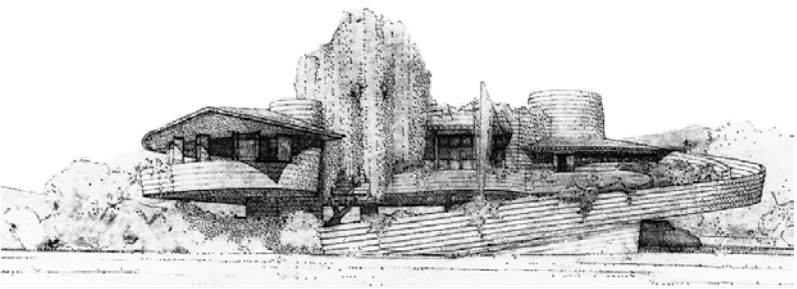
David Wright House elevation illustrating the spiralling structure.
